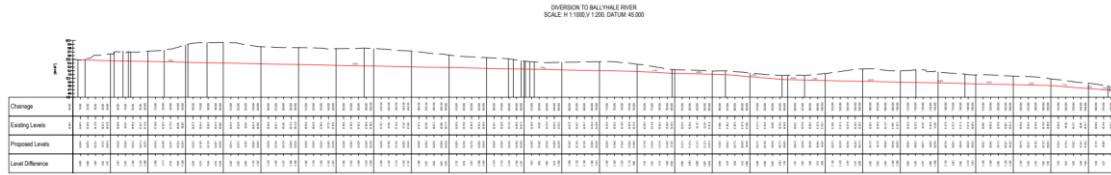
Option B Concept Longitudinal Section showing existing and proposed levels
